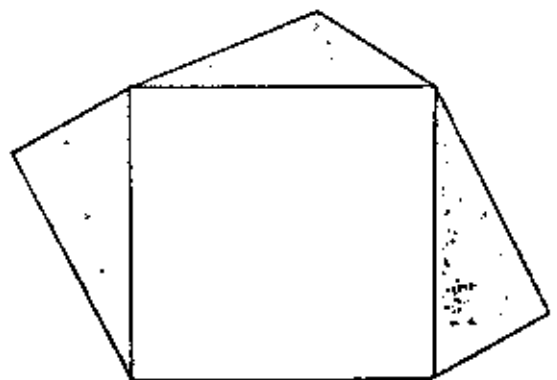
Outlines of maximum possible wedges in the roof and sidewalls of the tunnel, looking west.
